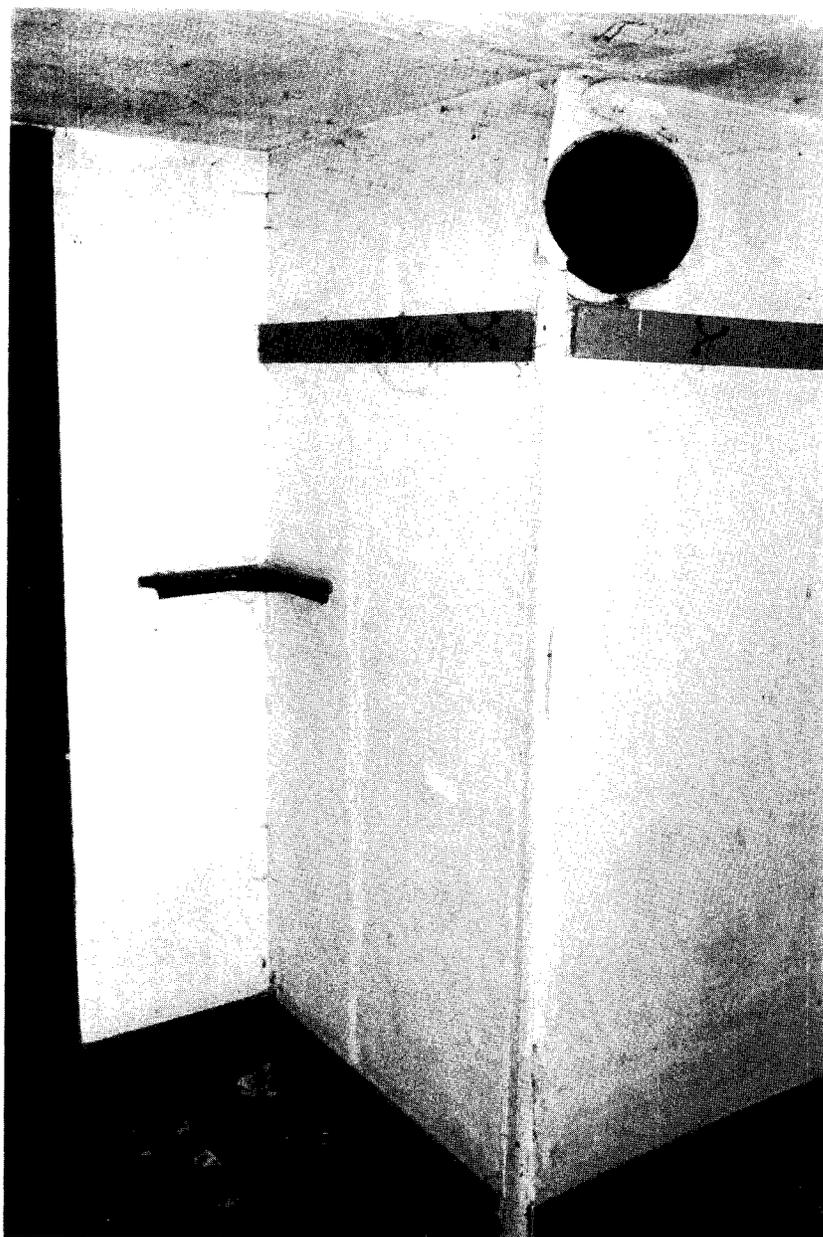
Penniman House: Finished Basement Space (Room 001), Southwest Corner (1984).
